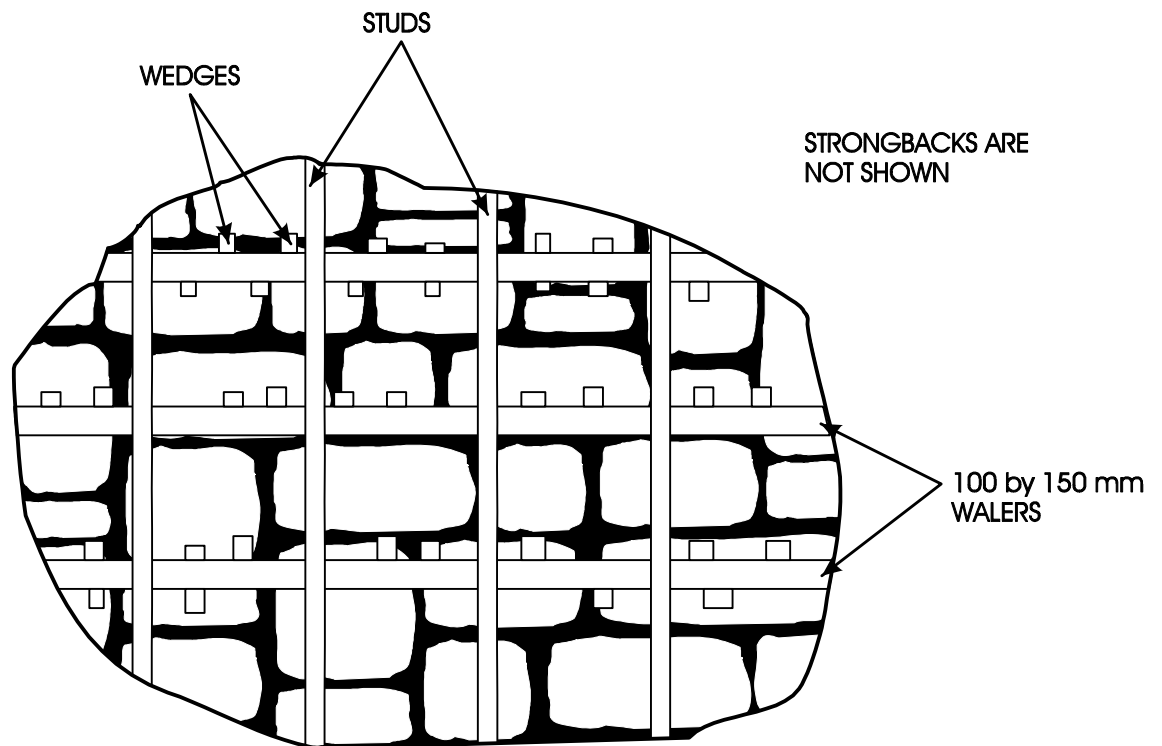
Wedge Method of Securing Stone Masonry Faces for Concrete Placement
